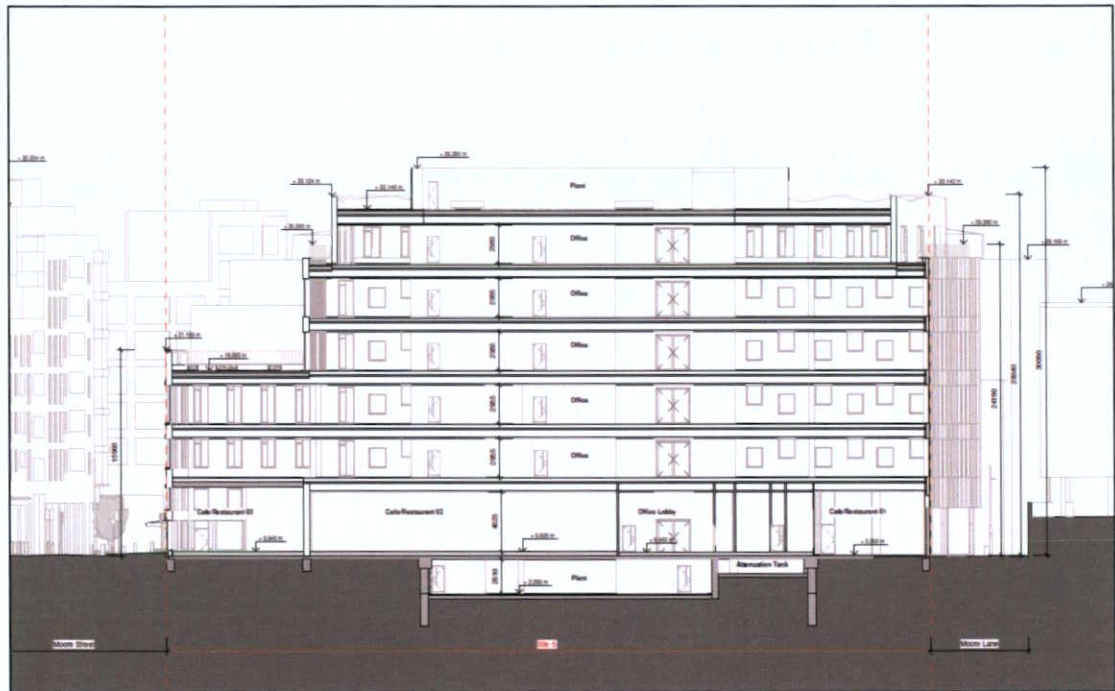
Cross section through Site 5 from Moore Street to the west to Moore Lane to the east.
